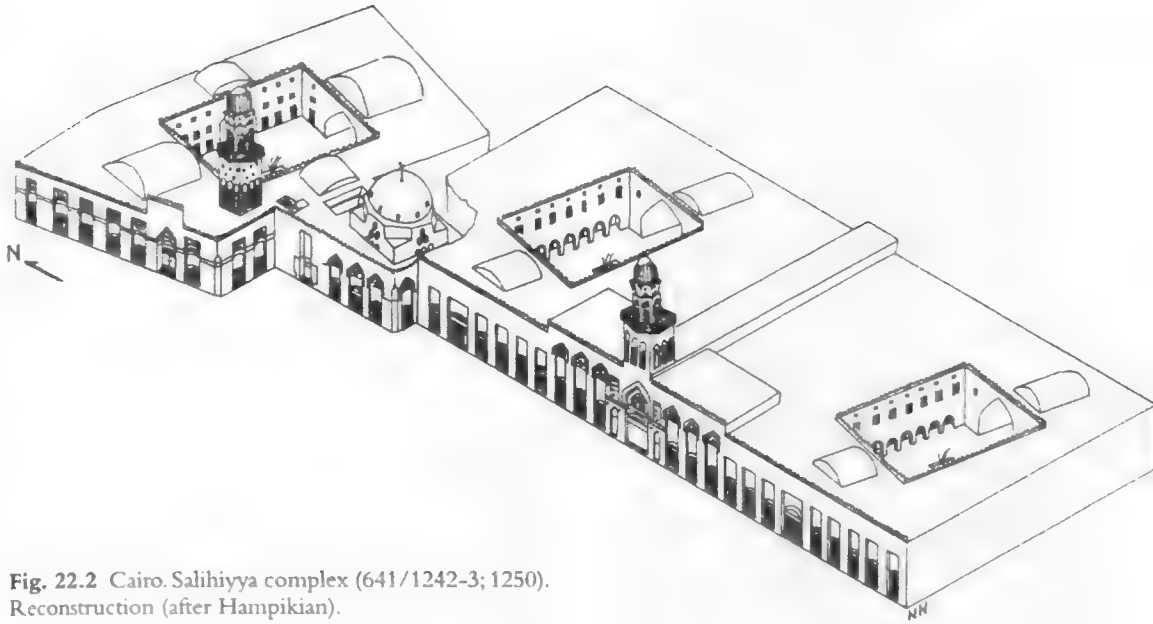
Cairo. Salahiyya complex (641/1242-3; 1250). Reconstruction (after Hampikian).
